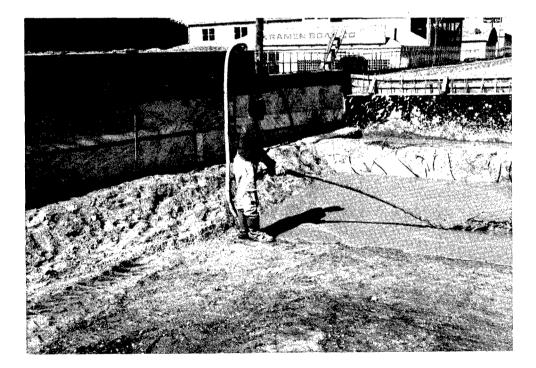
Foamed concrete fill behind existing abutment New York project.⁽¹⁴⁾
